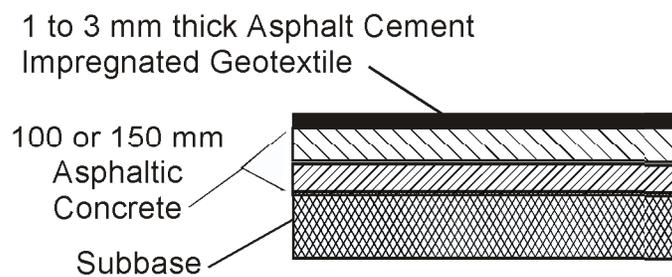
Cross-section of asphalt concrete and fluid applied asphalt-geotextile barrier.
